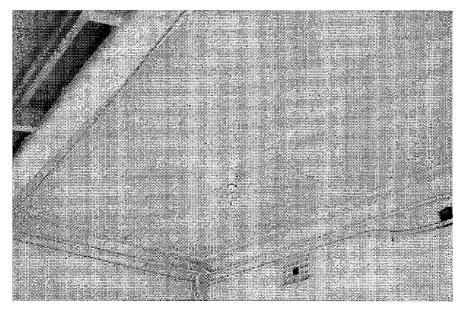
Example of asbestos cement sheeting located above the rear entrances to residential tenancies 89A-D and 91A-B.
